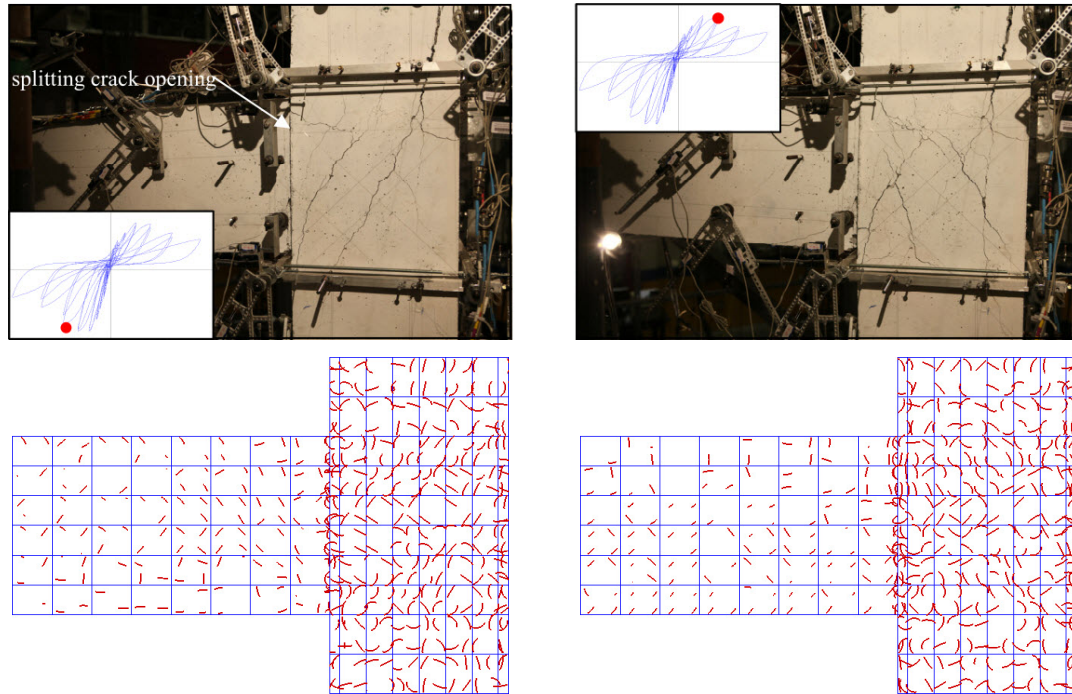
XZ-Face Joint Crack Pattern Prior to Failure for Park Specimen
